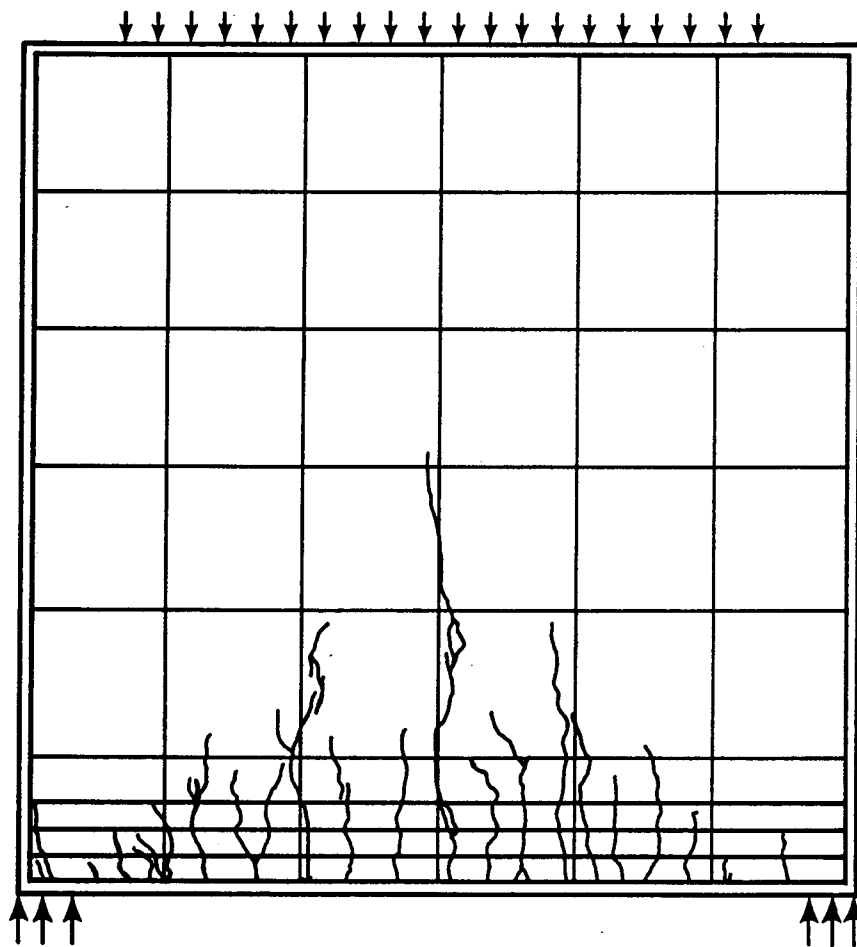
Crack Pattern at Failure Observed in Test,
